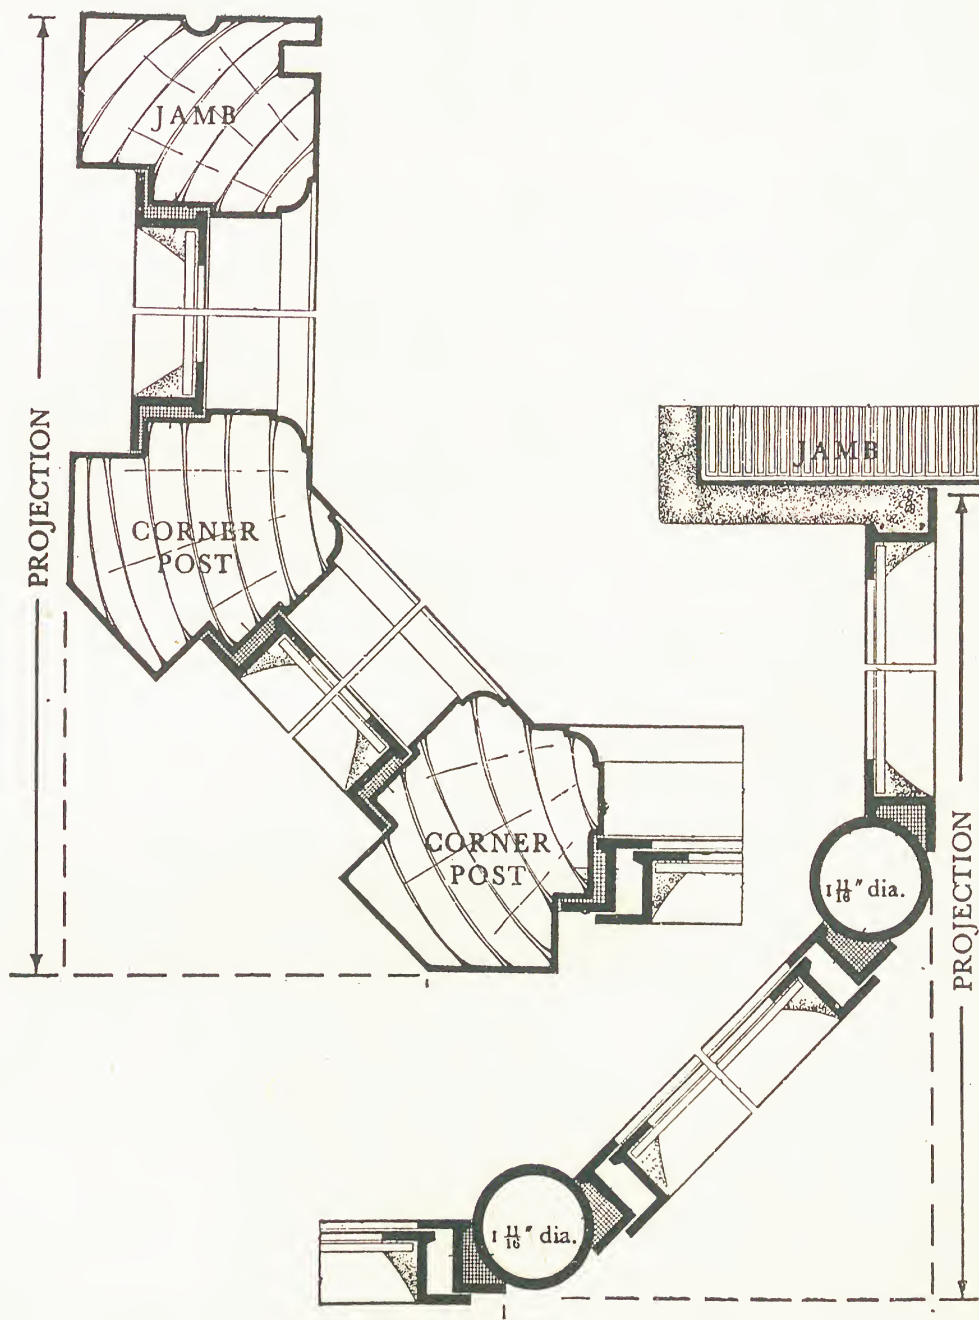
Standard steel windows in bays. (Left) wood mullions. (Right) steel tubular mullions. (Courtesy of Henry Hope & Sons, Ltd.)
